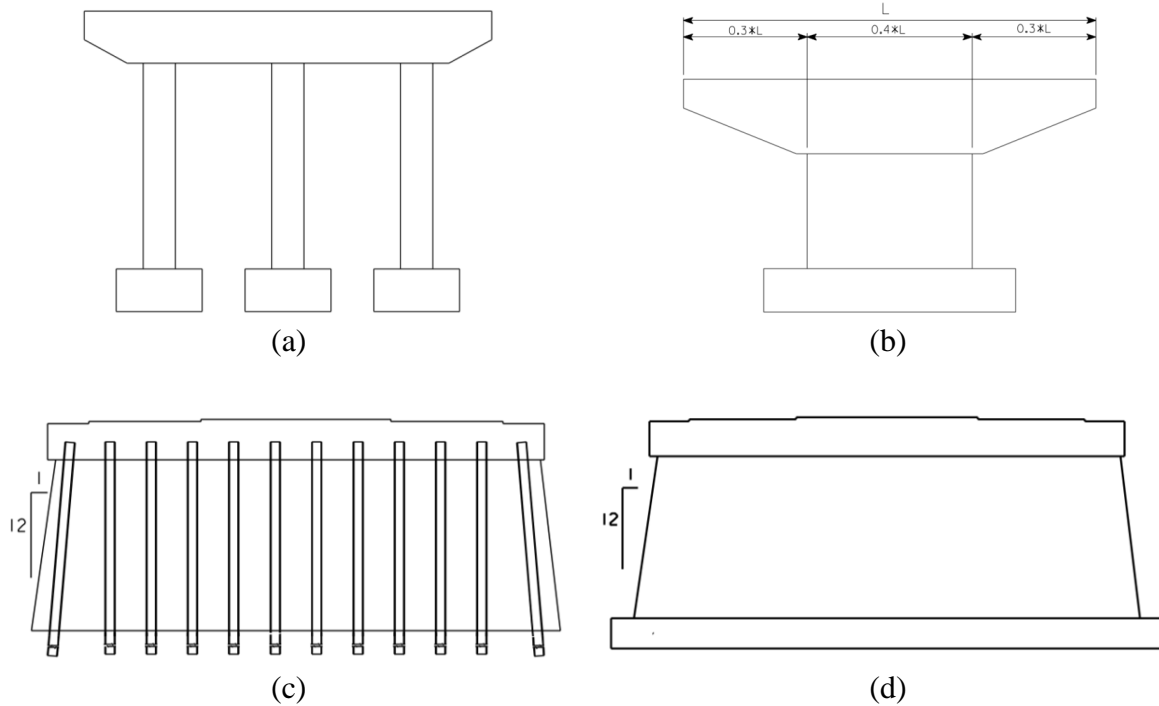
Bridge piers: (a) frame pier, (b) T-pier, (c) pile bent, and (d) diaphragm pier
